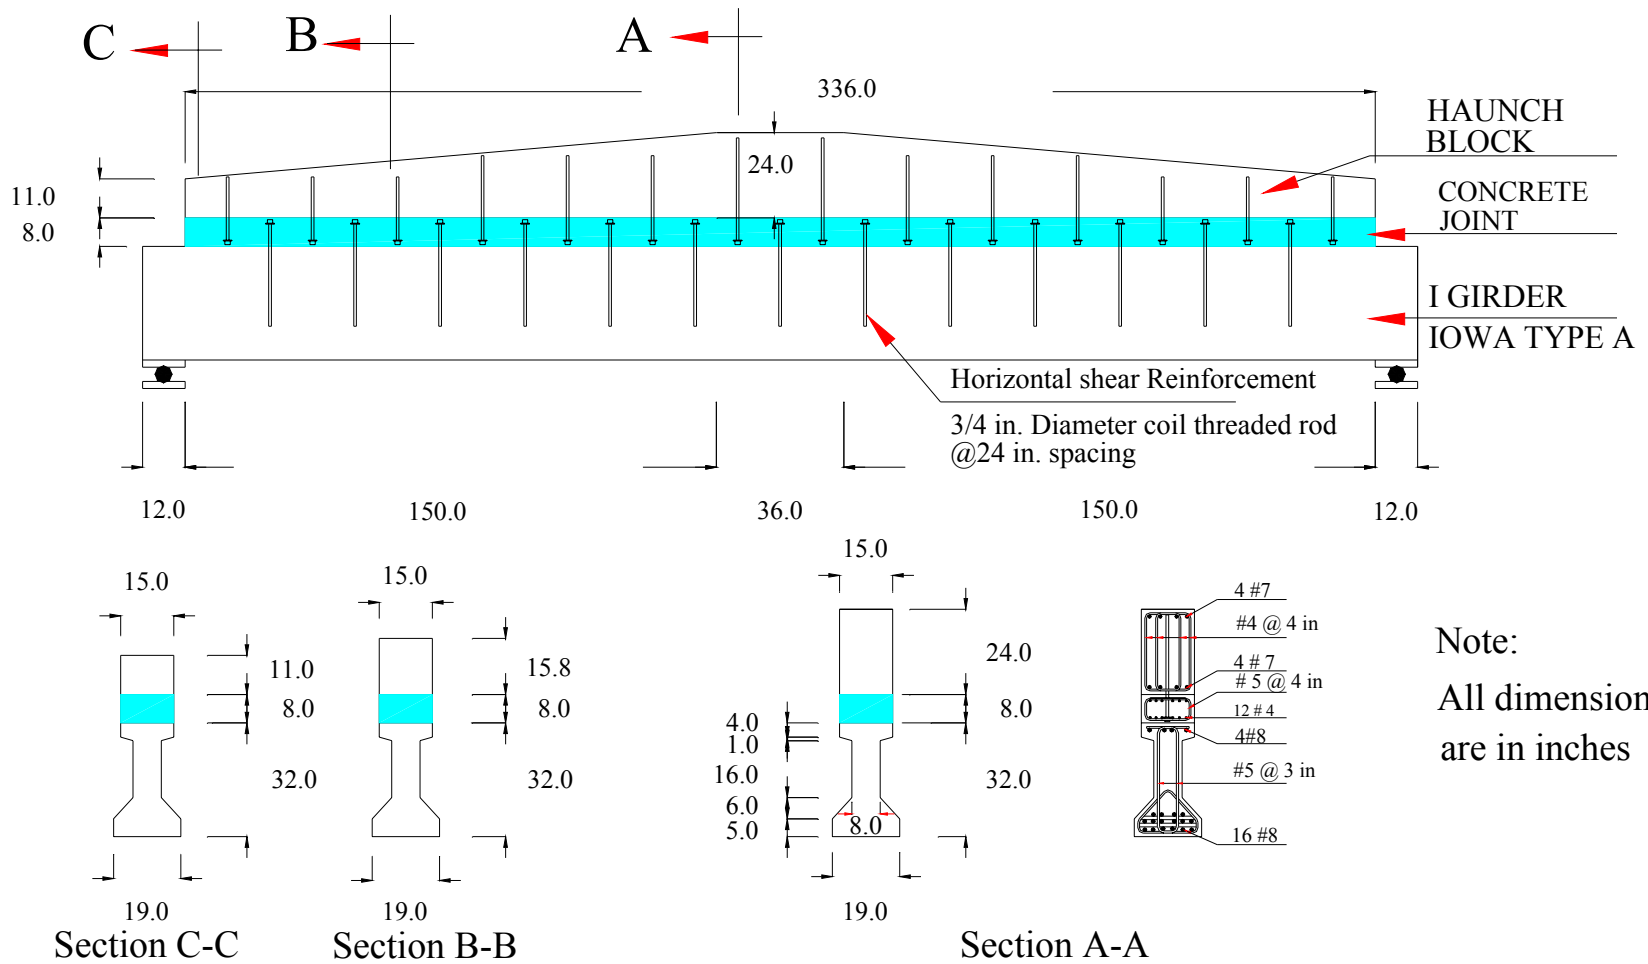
Full Scale-Test Concrete Dimensions and Reinforcement Details
